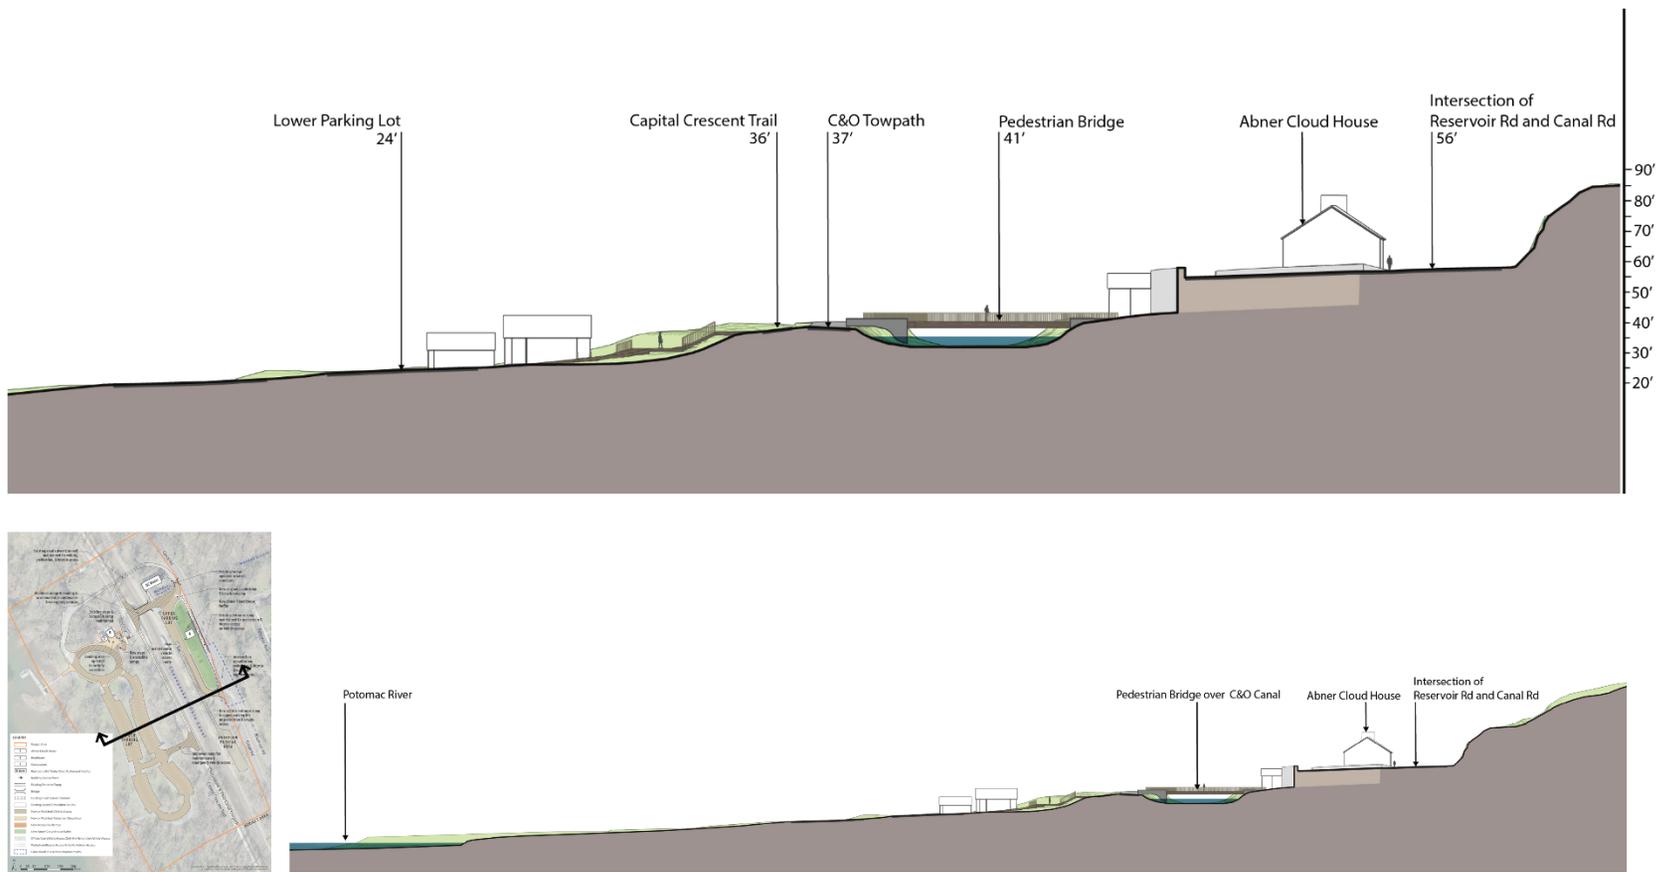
Section and Elevation of Upper Parking Lot Access Alternative (Alternative B) (detailed and full section of site)
